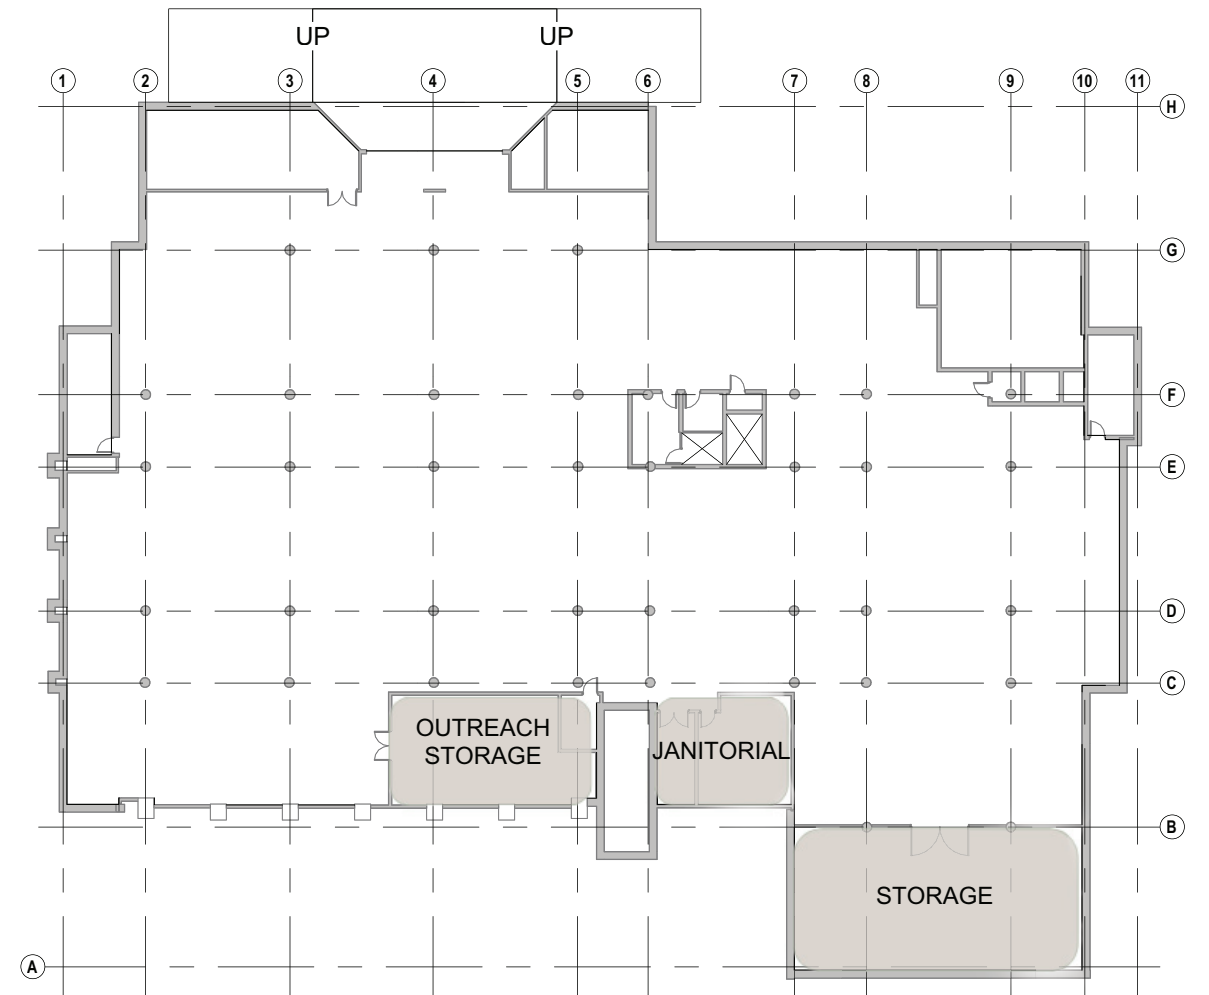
Exhibit A: Architectural Space Plans: Existing and Proposed (Key Floor Plans)
